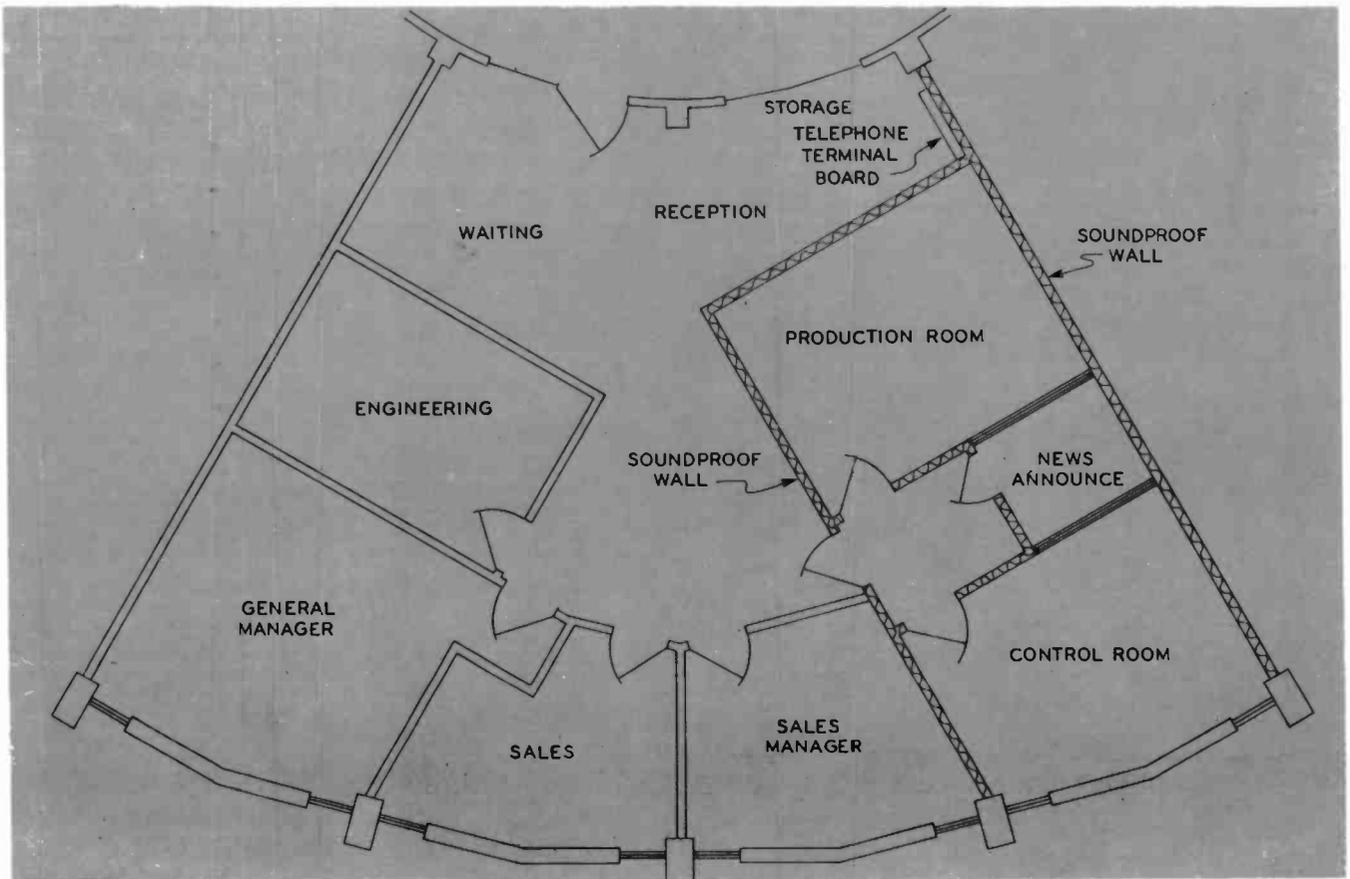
Floor plan of the WMJR-FM facilities.
